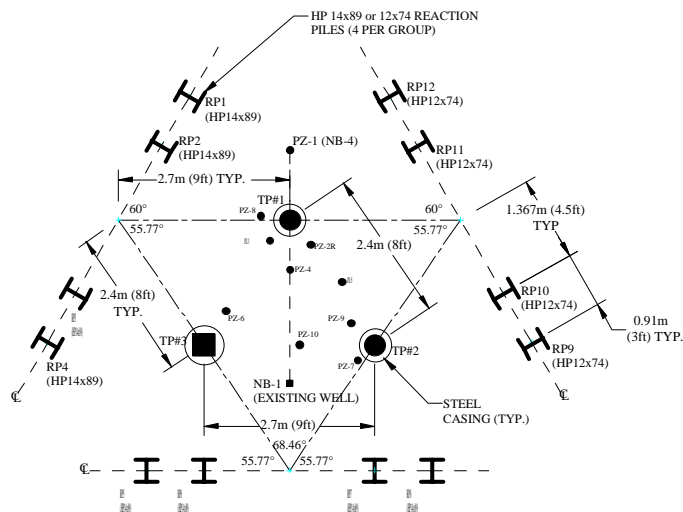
Newbury Site Plan View (Paikowsky and Hajduk, 1999).
